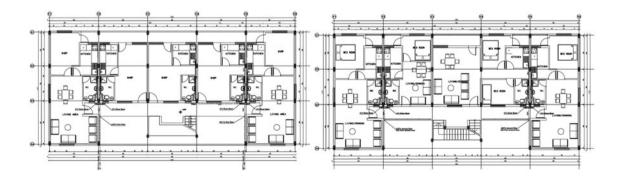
Ground floor plan; first and second floor plan for MSB.
